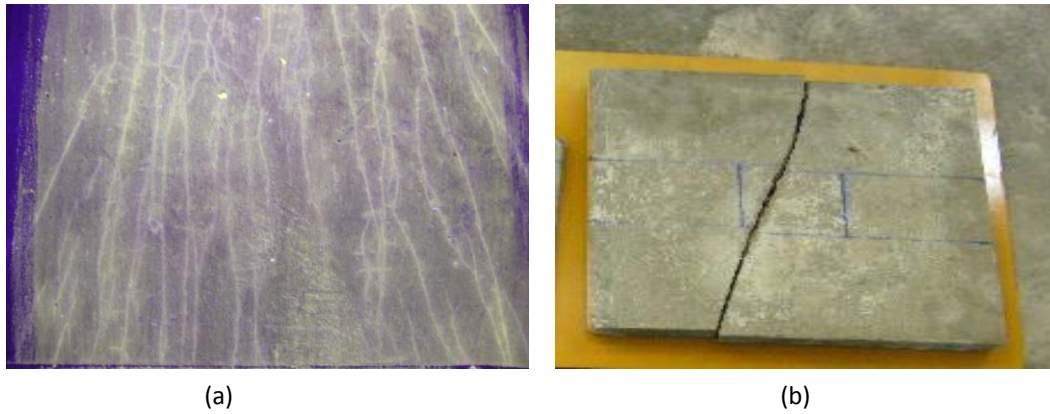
(a)10mm ECC plate with multiple fine cracks (b)10mm mortar plate with 1 through crack
